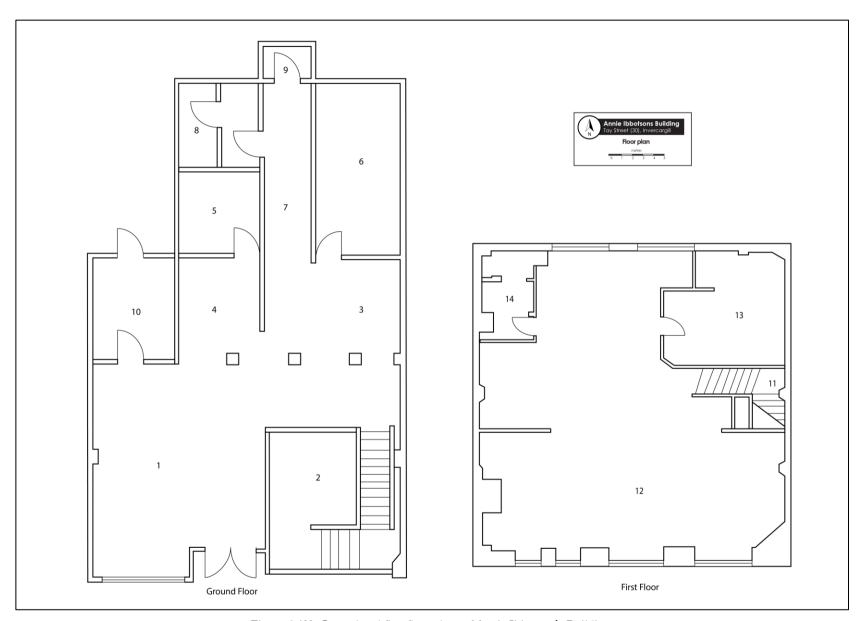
Ground and first floor plans of Annie Ibbotson's Building.
